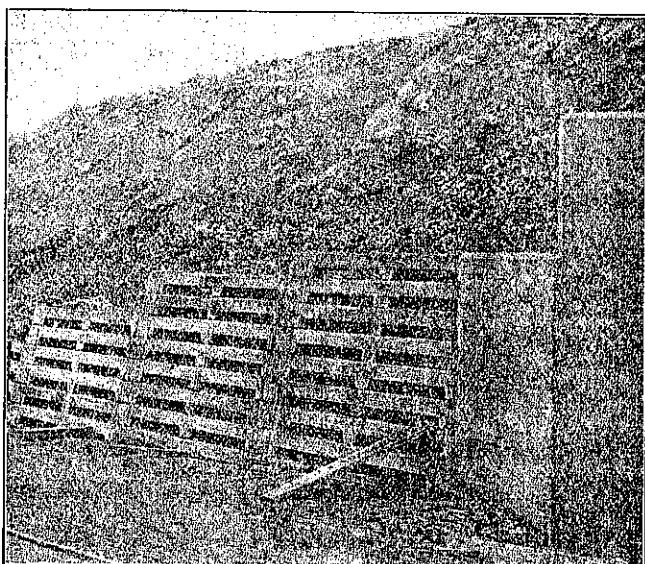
CONCRETE CRIBBING RETAINS TOE OF FILL
